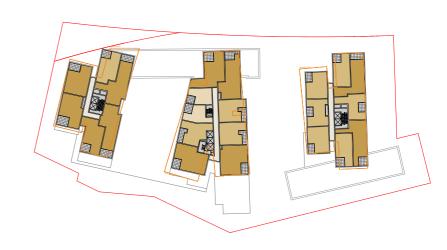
ADG - Ventilation and Solar Access. Amended and approved Design Report, 19.03.20, Rennett and Trimble.
